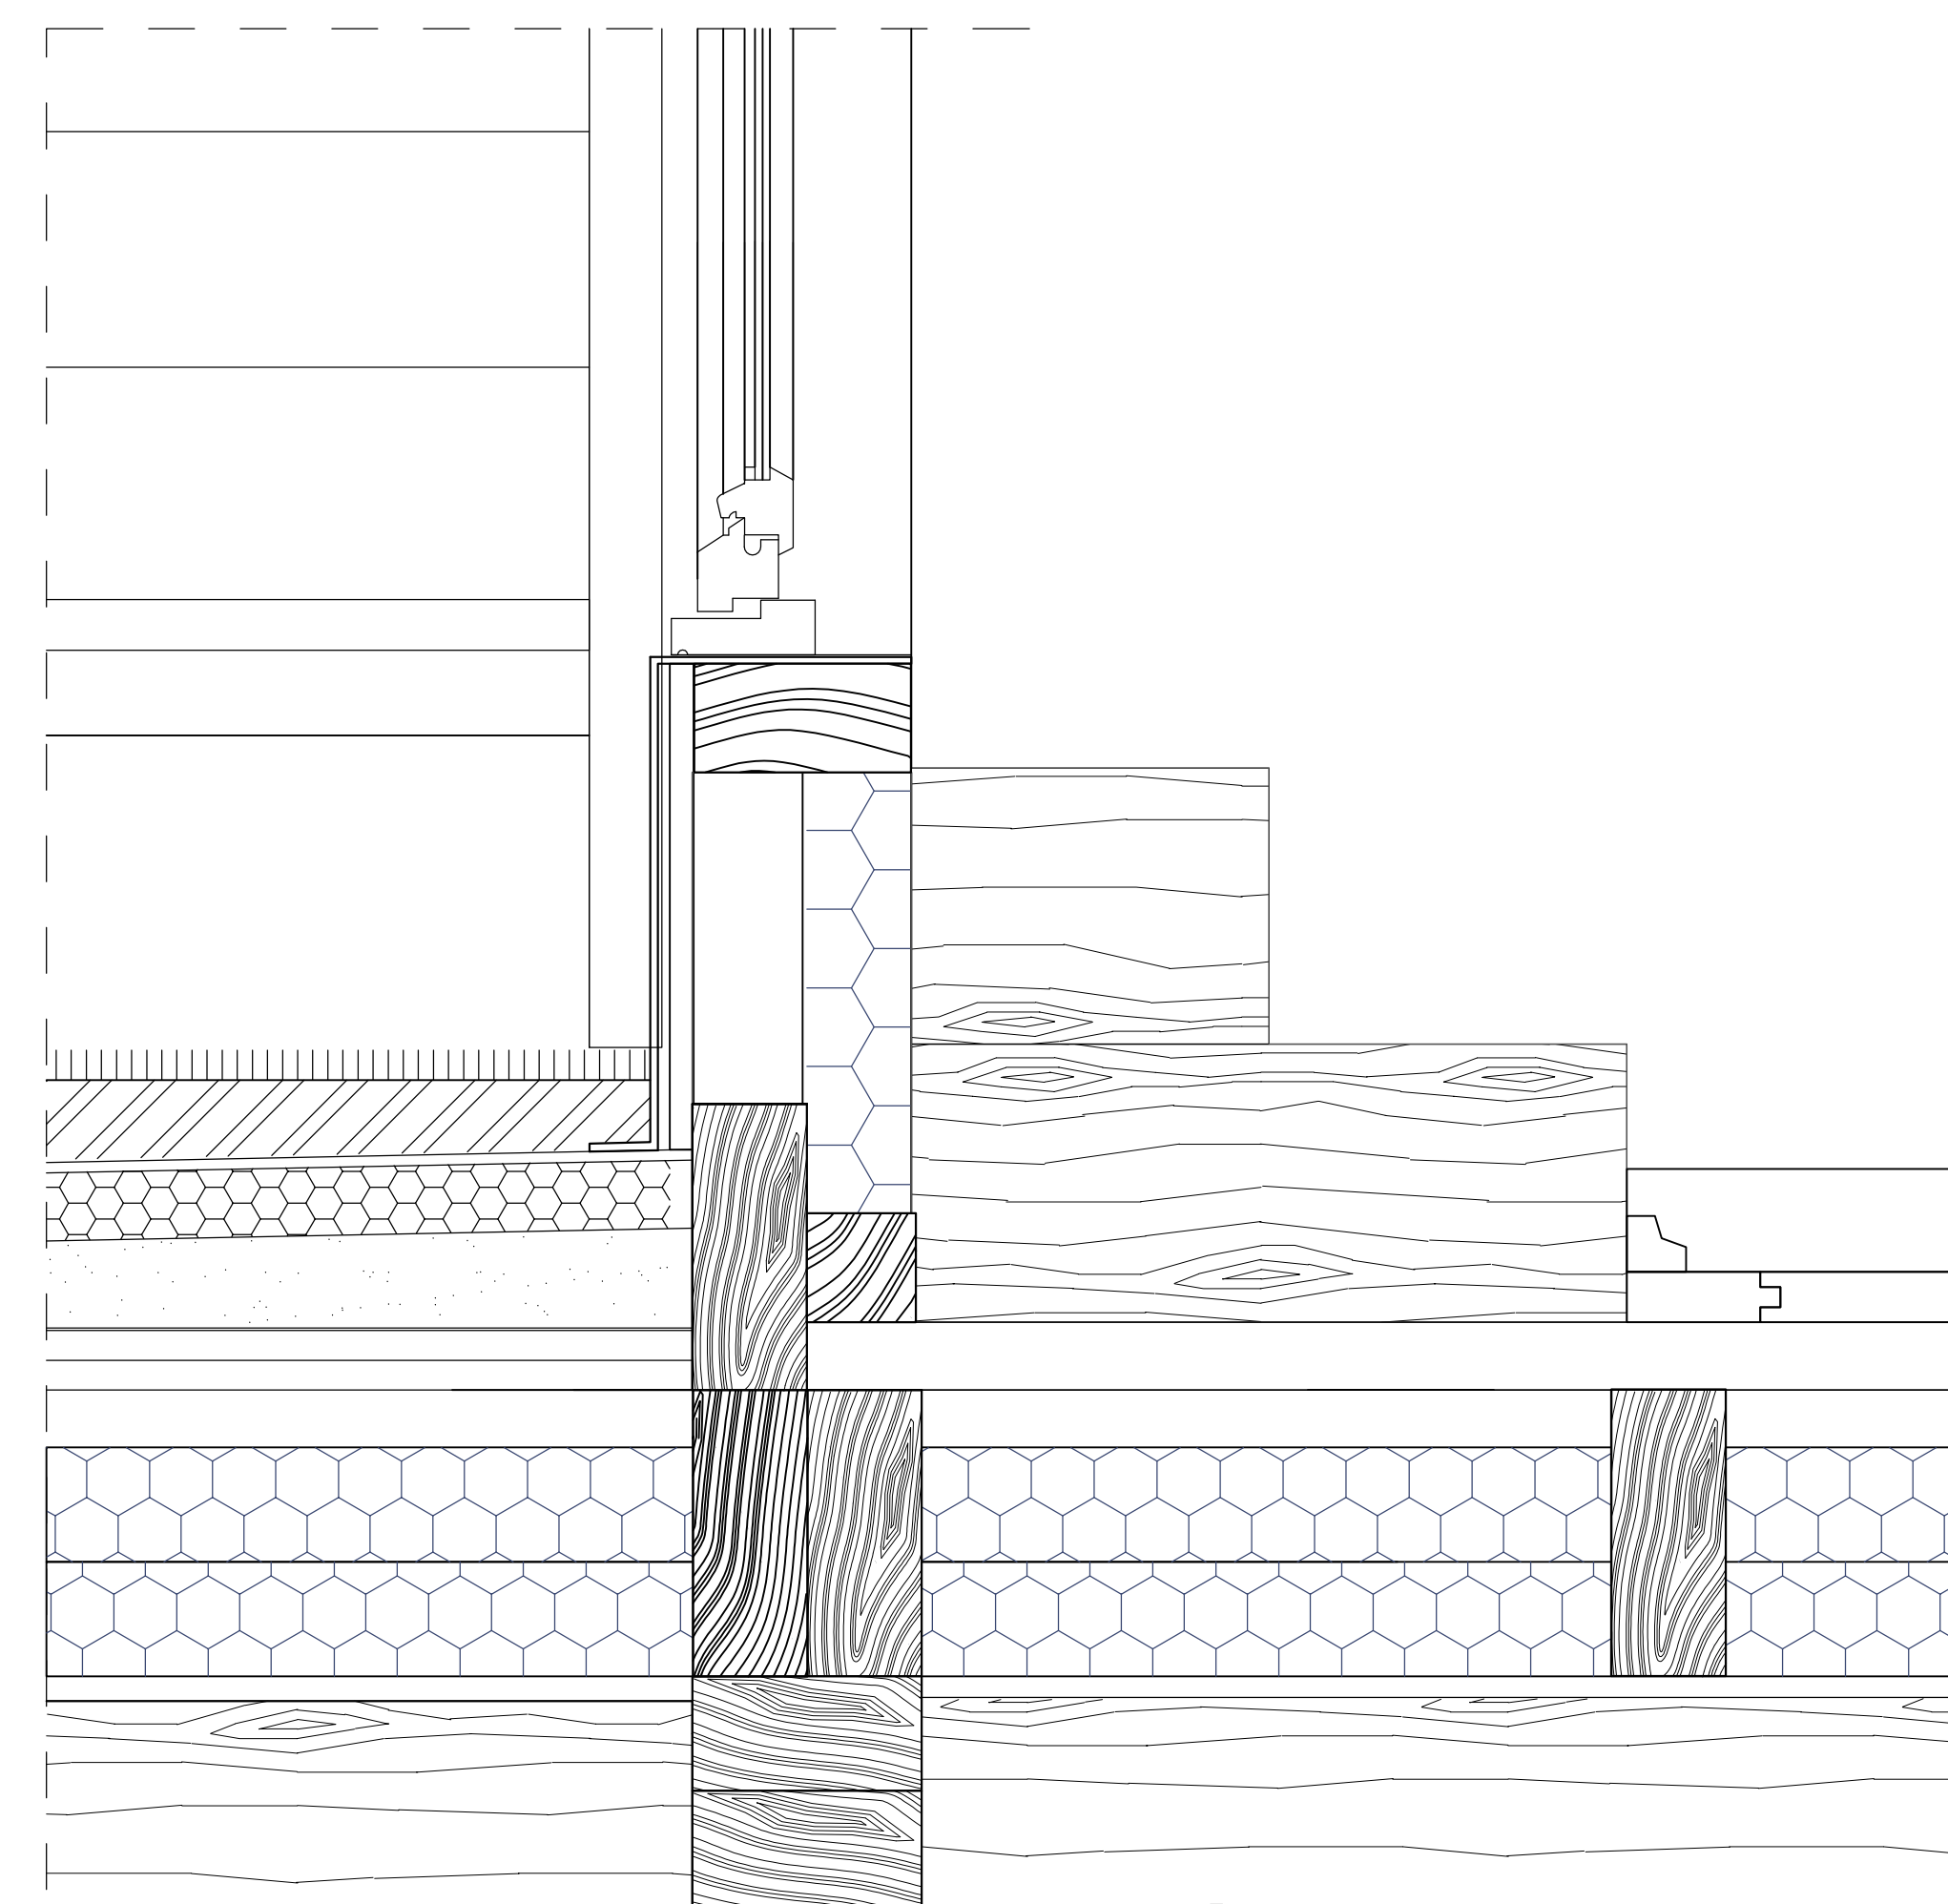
DETAIL E, F, FLOOR CONNECTION BETWEEN LEVELS AND FOUNDATION
